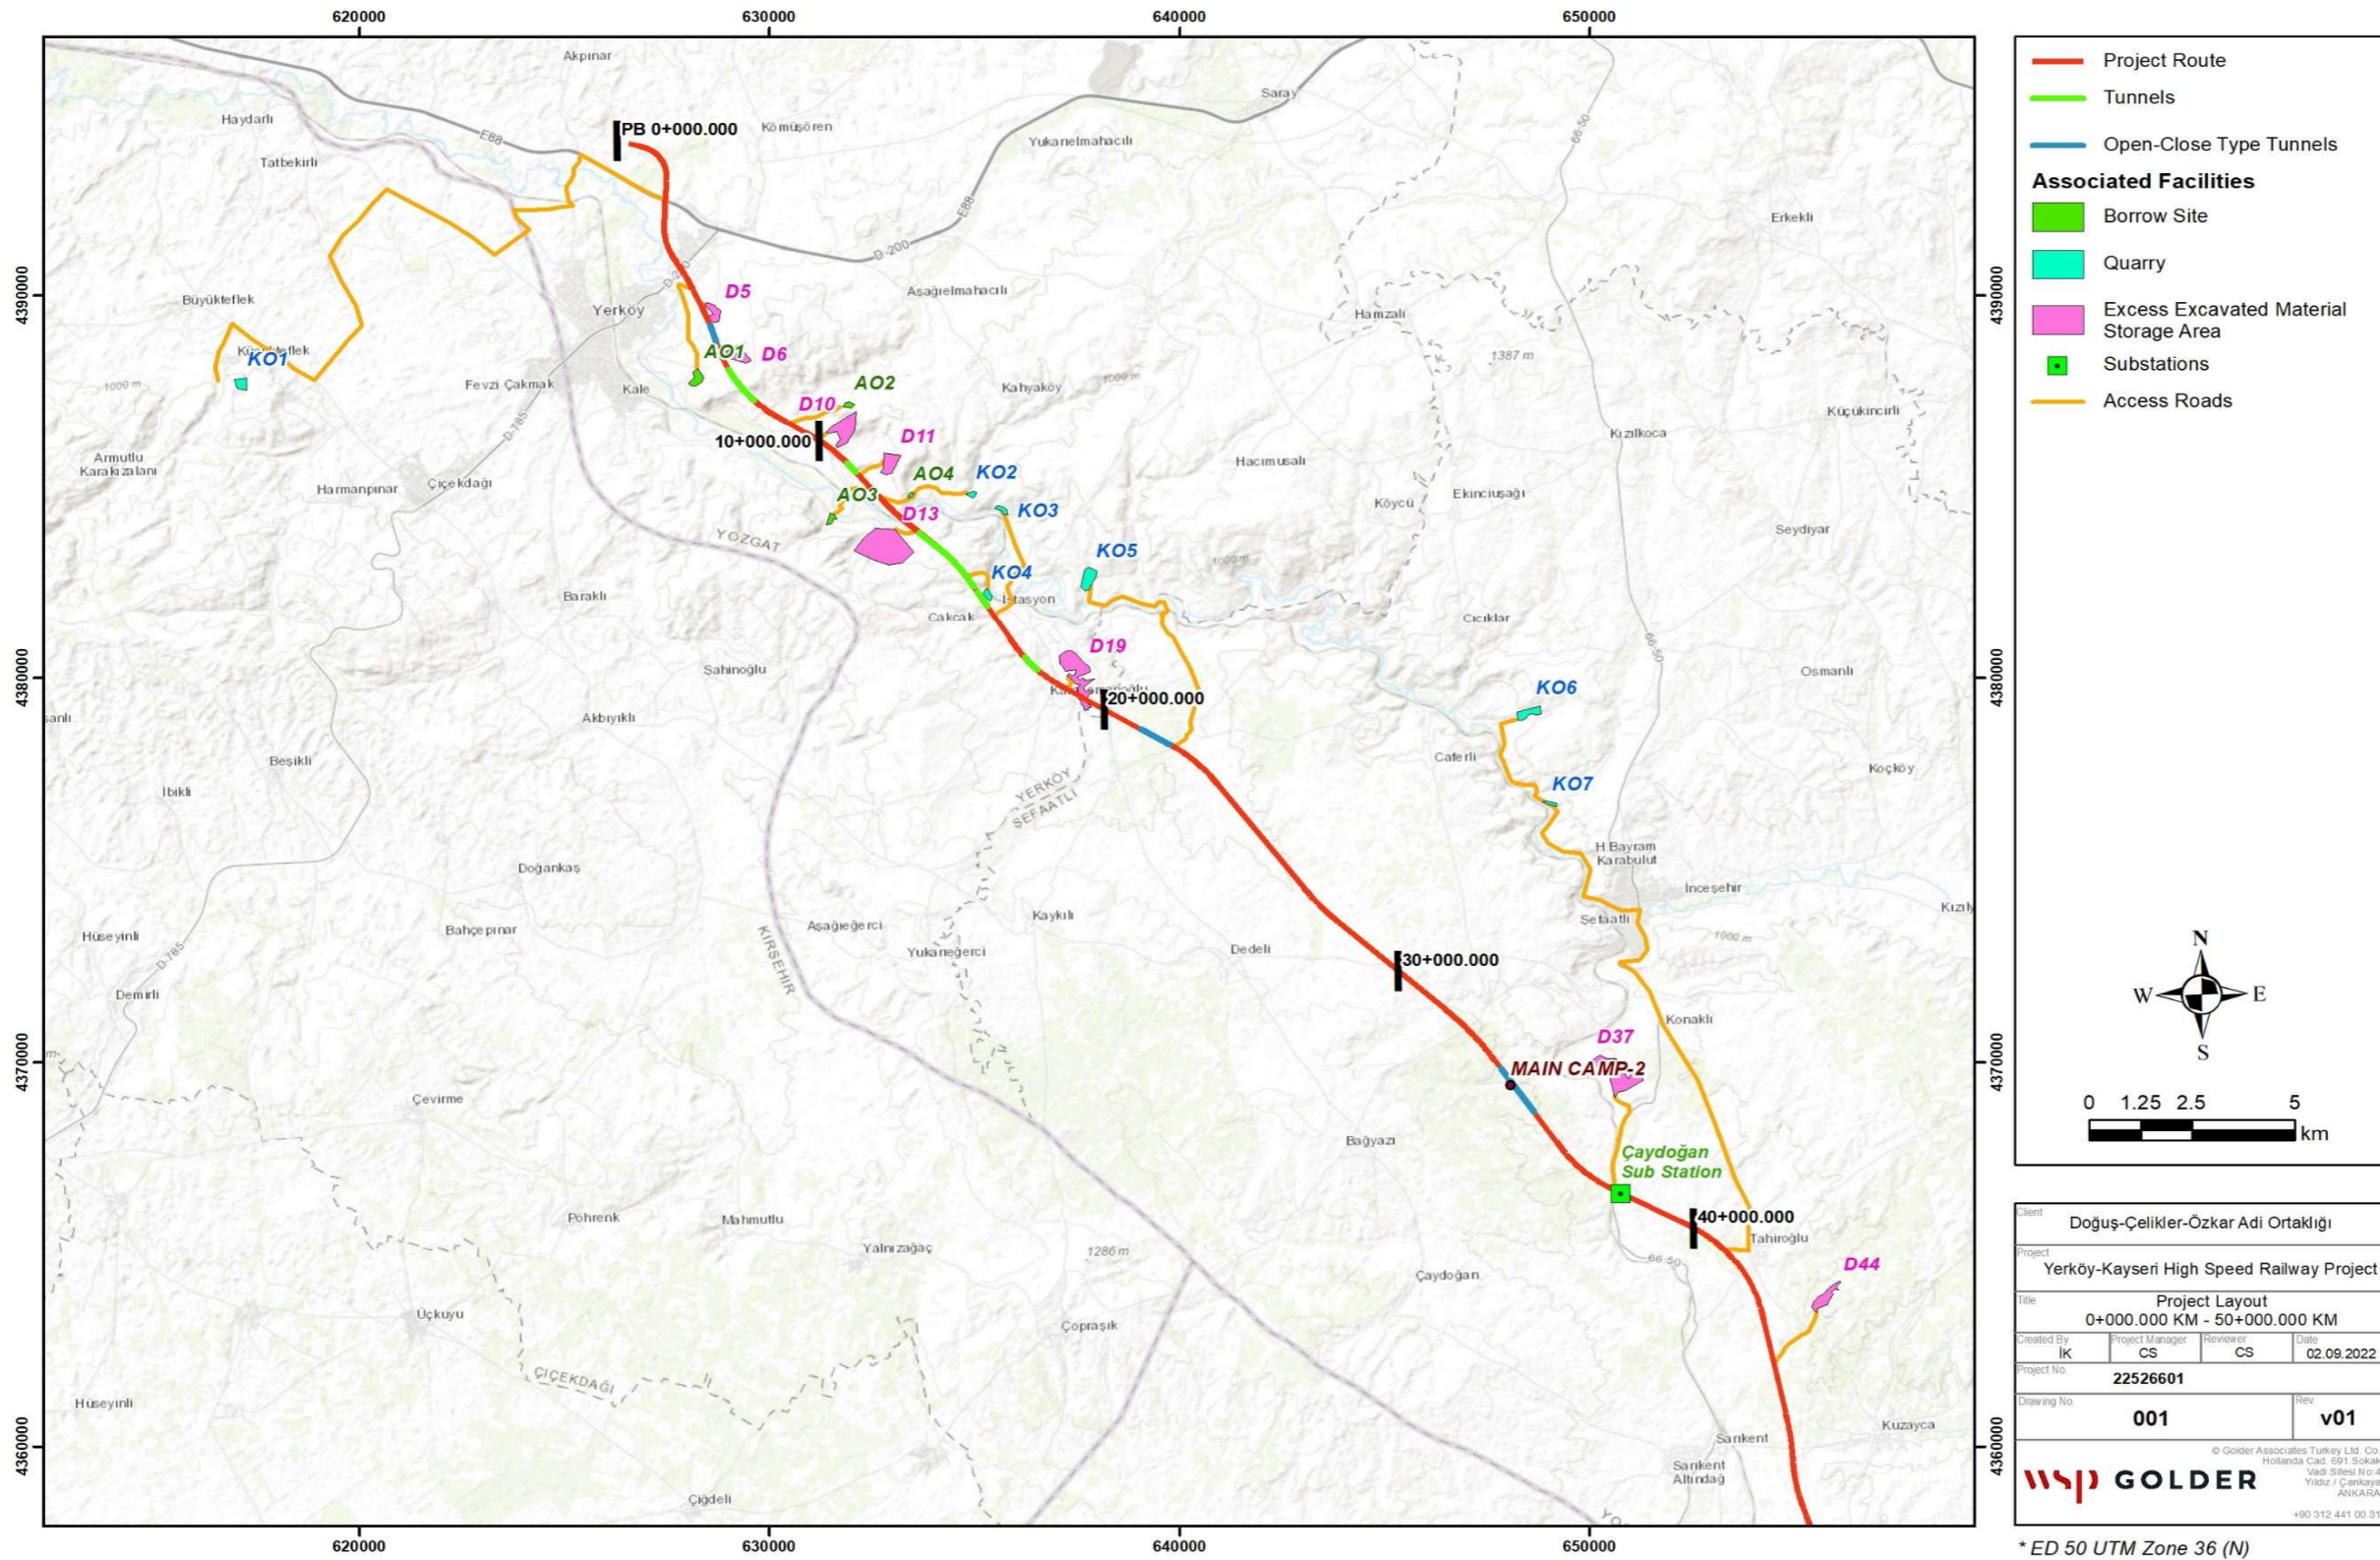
Project Layout 1 (Source: ESIA, 2022)
